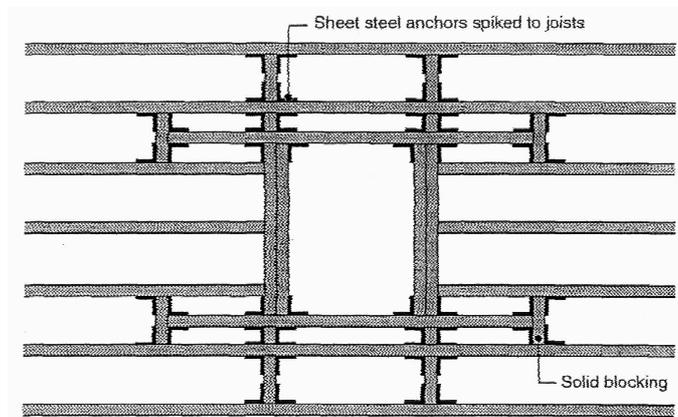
Diaphragm framing around opening (Source: CWC, 1997)
